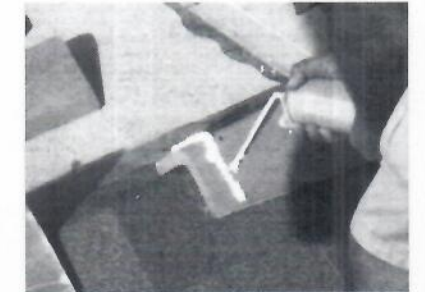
APOC 705 Polyset RTA-1 Roof Tile Adhesive applied to fastened tail of Lap Ridge Tile
